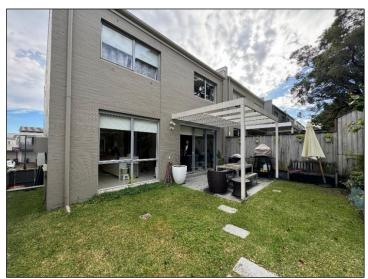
Rear yard looking towards the rear of the semi-detached dwelling where proposed deck and pergola extention is to occur (Source: Council's Assessment Officer).
